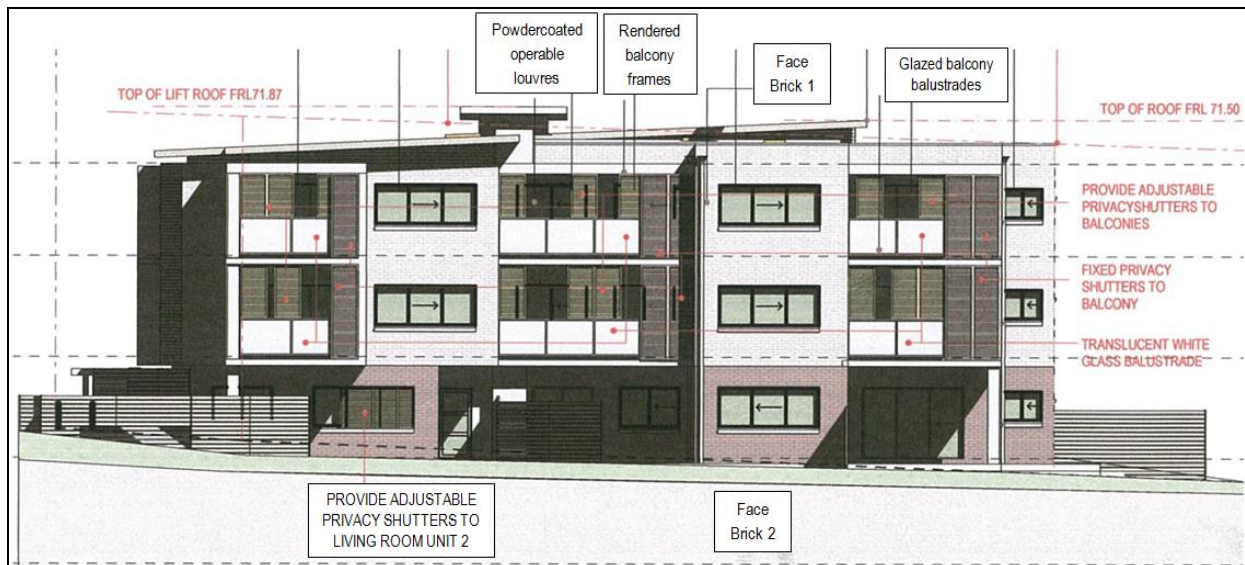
Southern elevation showing louvres and use of obscure glazing.
